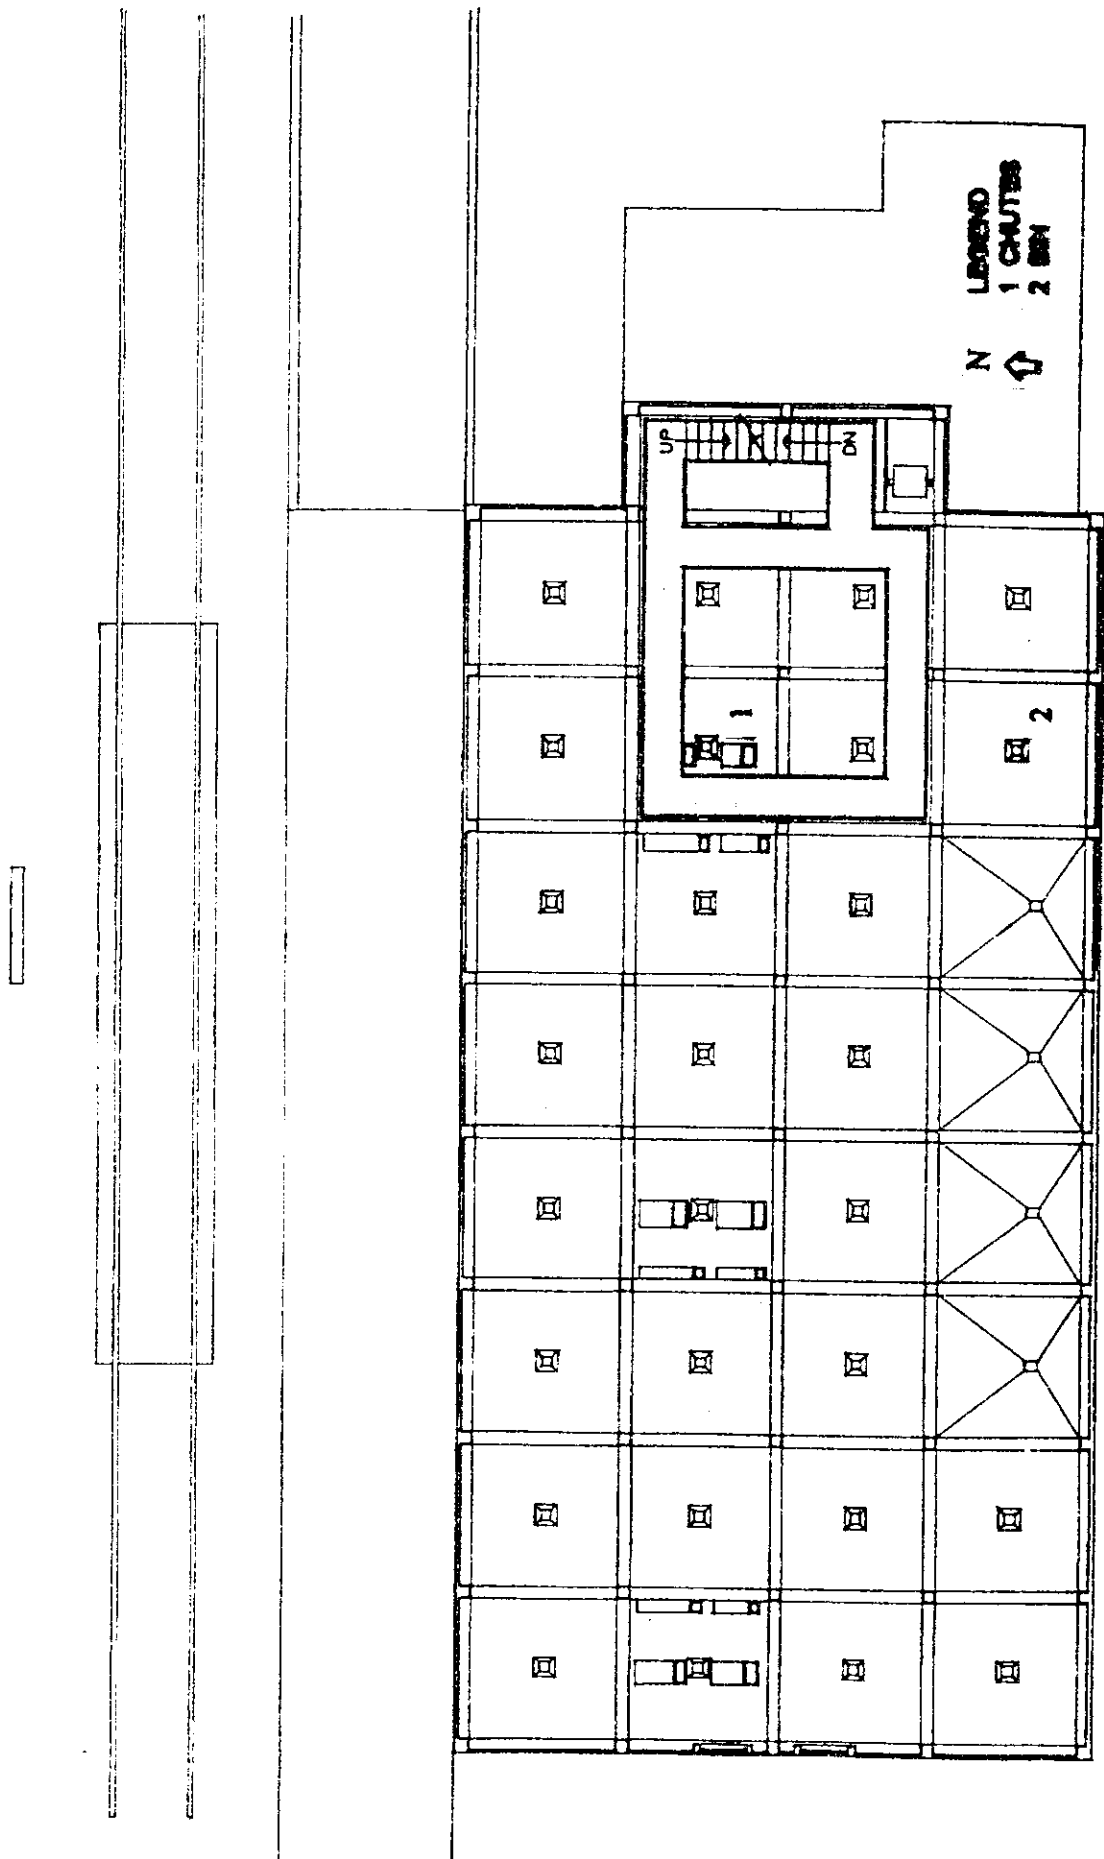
Armour's Warehouse, La Salle County, Illinois. Bin-Catwalk Floor (second floor).
